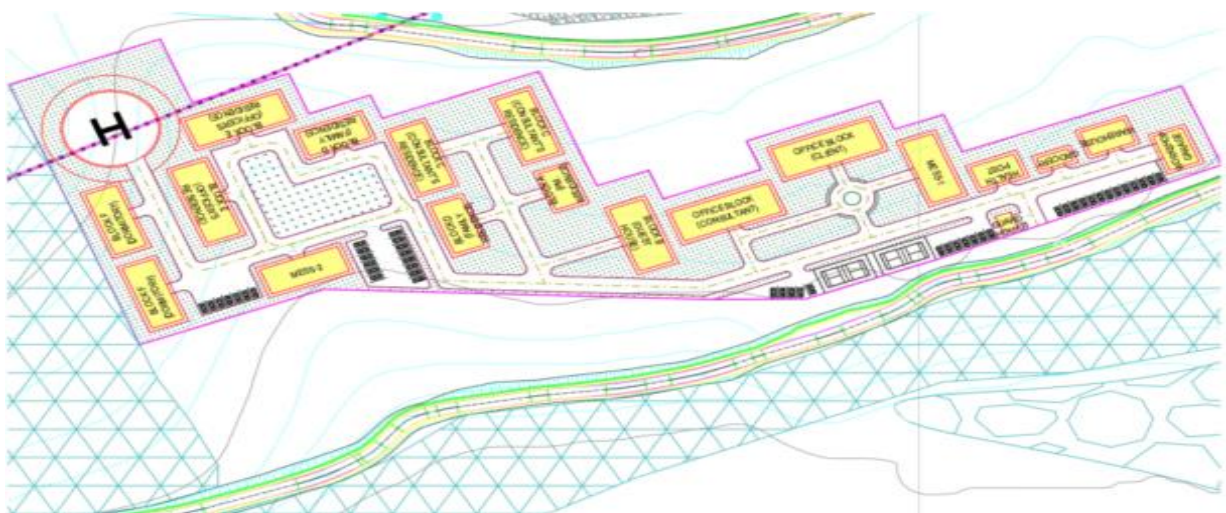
Plan view of Powerhouse camp (Source: Detail Design Report, 2021)
